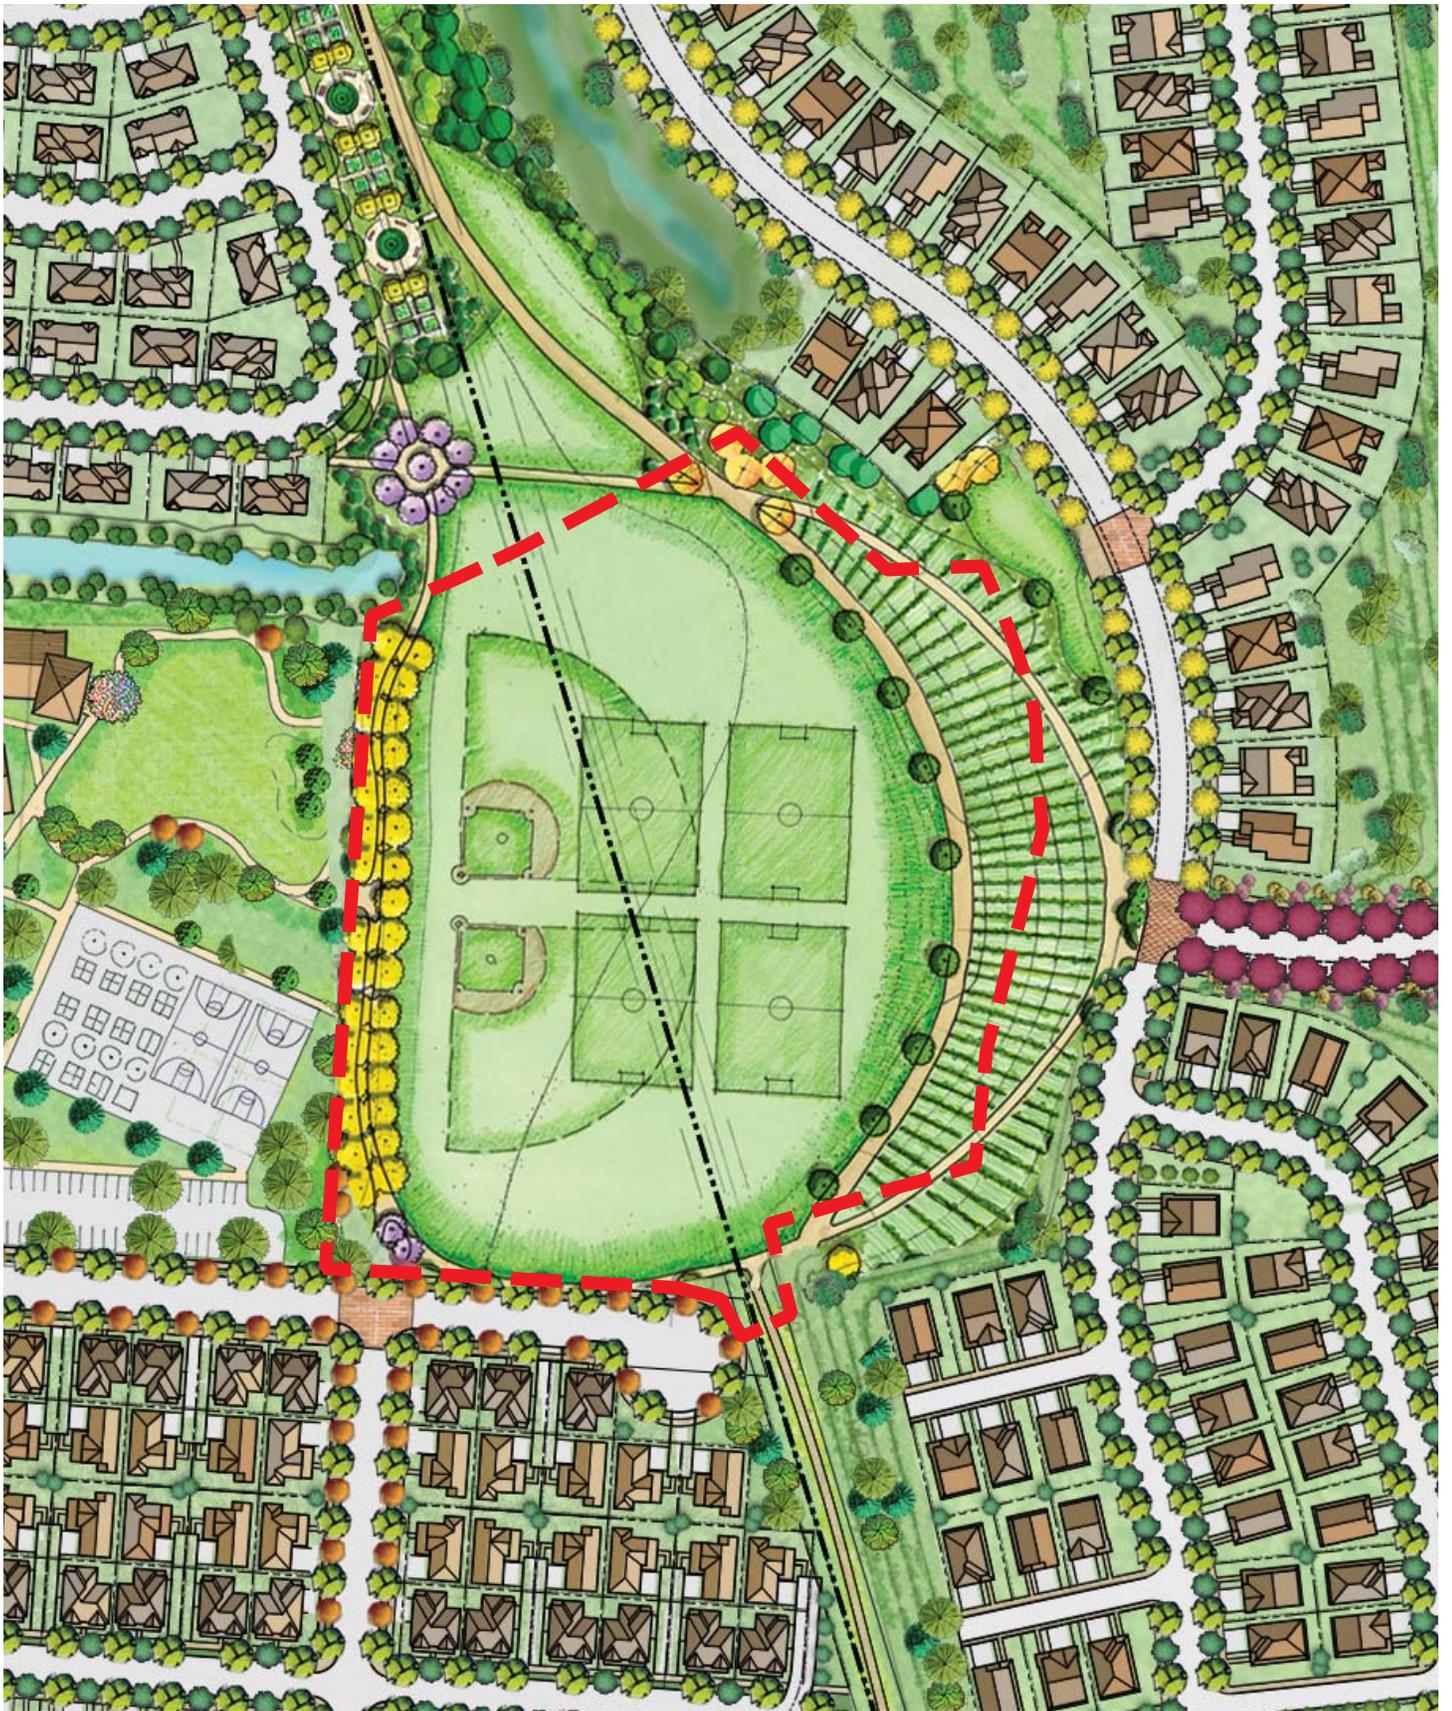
Illustrative Plan - Park A - Subject to Modification
